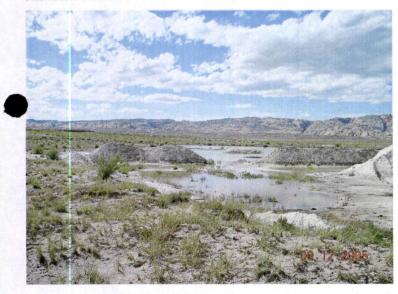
Looking west toward the San Rafael Swell. Note the windrow of material across the center of the photo and the stockpile in the center right.
